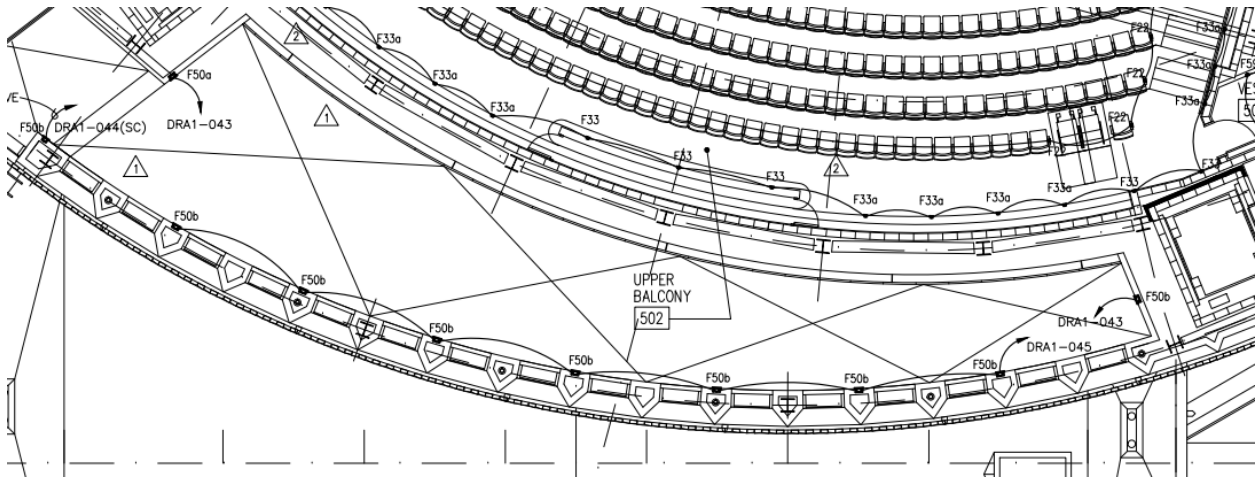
Upper Lobby Level 05 Floor Plan
